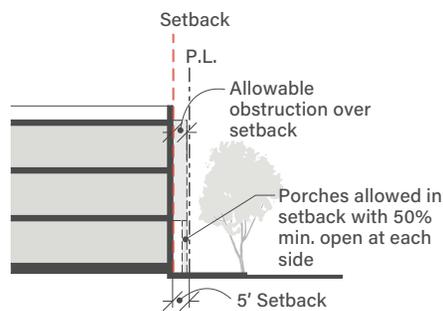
Type C – West Street and San Ramon Paseo Setback
